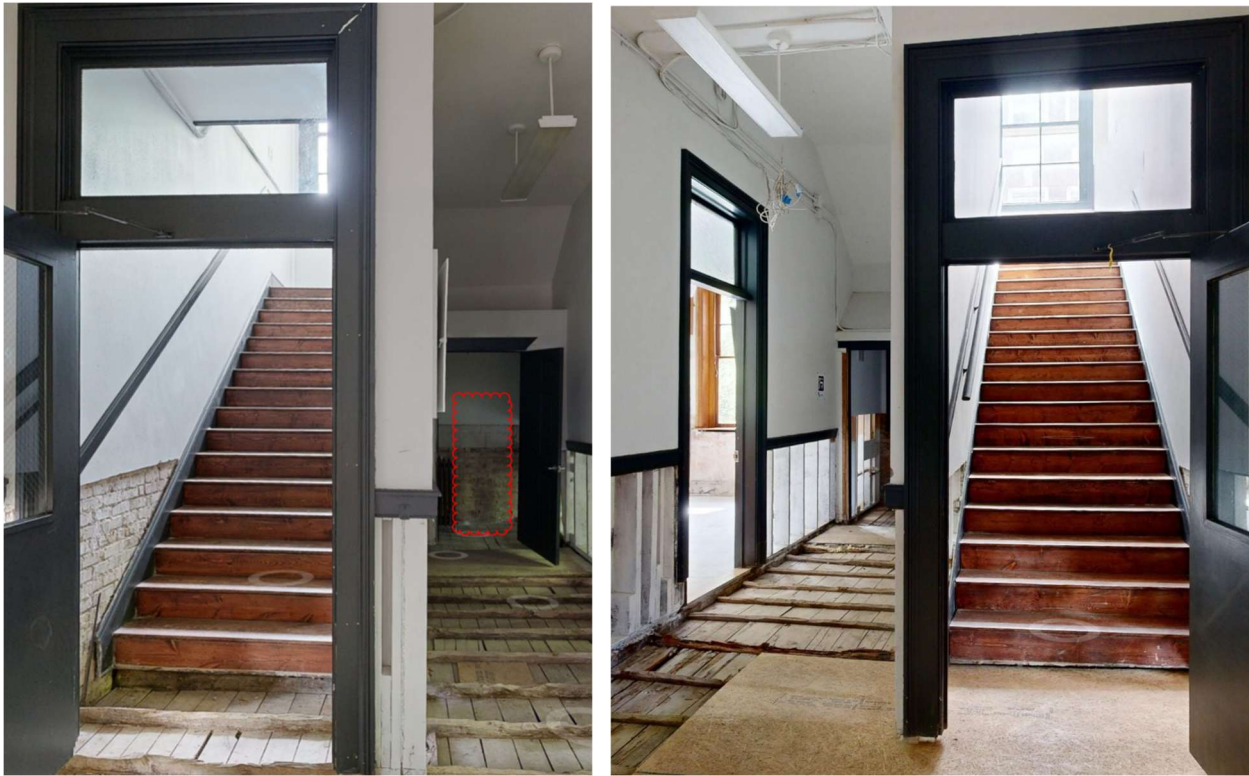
Existing plan West stairway with highlighted location of proposed accessible exit (Left). Existing plan East stairway (Right).
